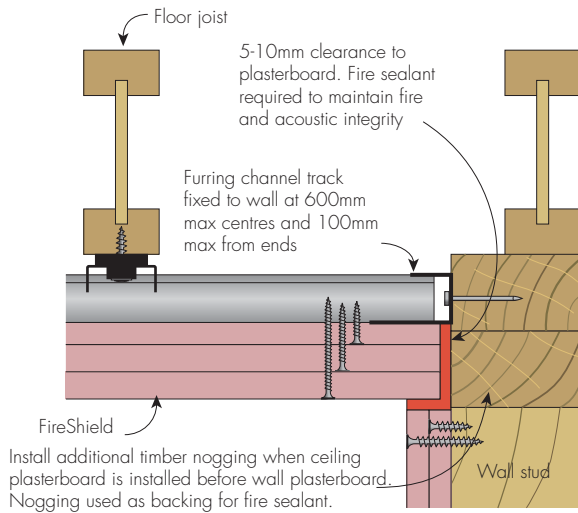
Fire Rated Ceiling to Wall – Alternate Detail
